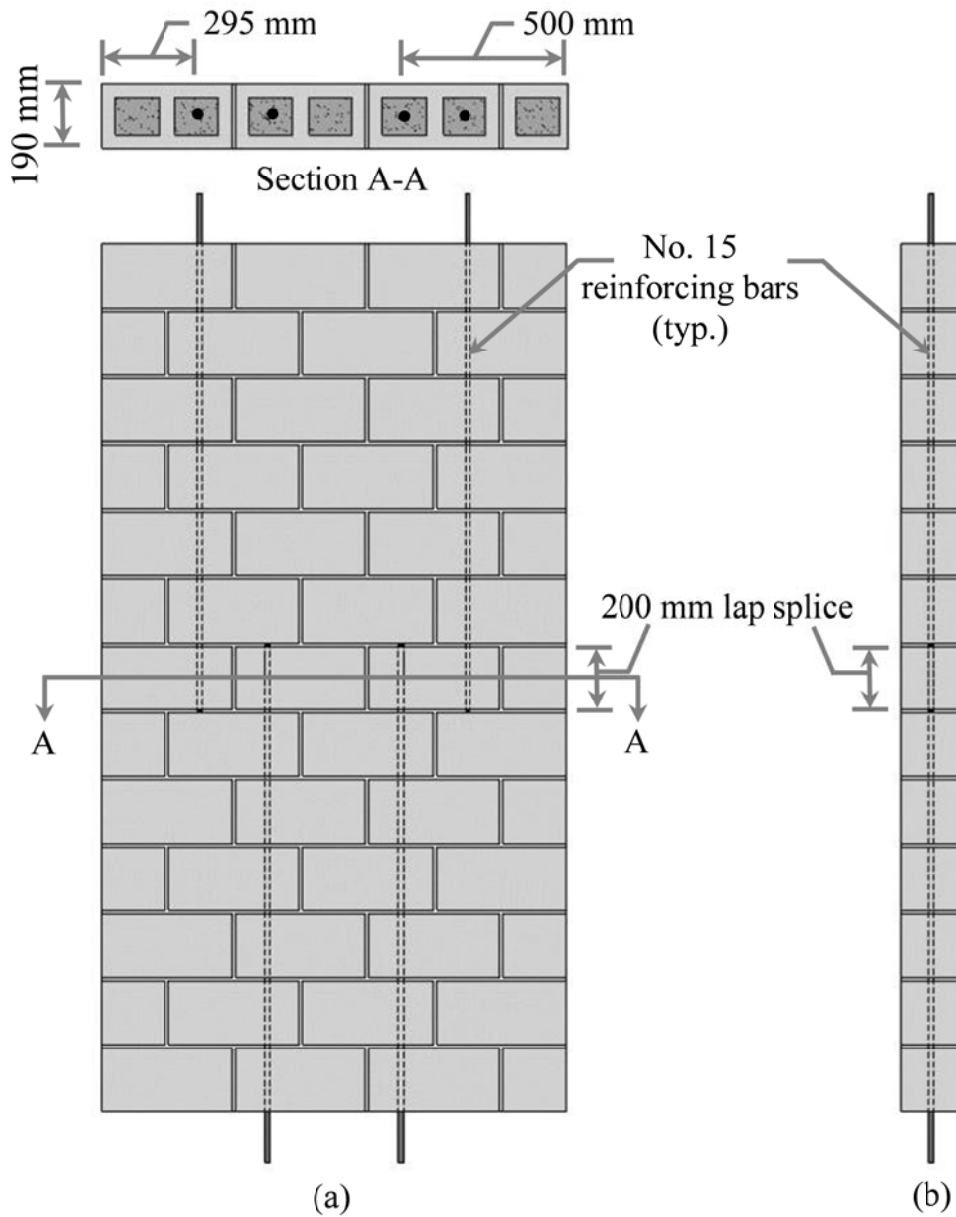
Remedial Wall Splice Specimen with Grouted Confinement Cells (GCC): (a) Elevation Including a Section at Splice Level, and (b) Side Profile.
